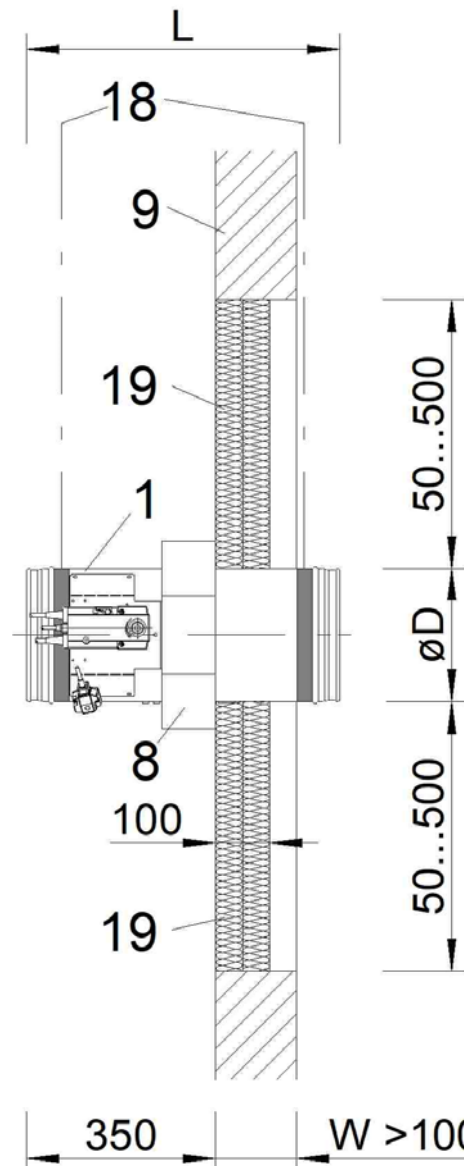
Installation in solid wall (wall thickness > 100 mm)
